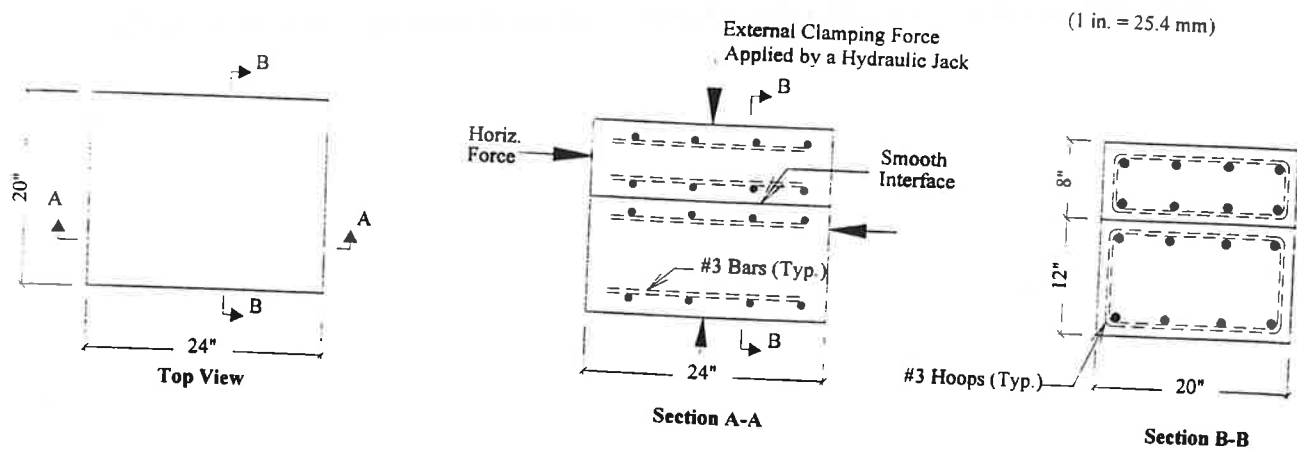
Series 3 and 4 Push-off Specimen Details
